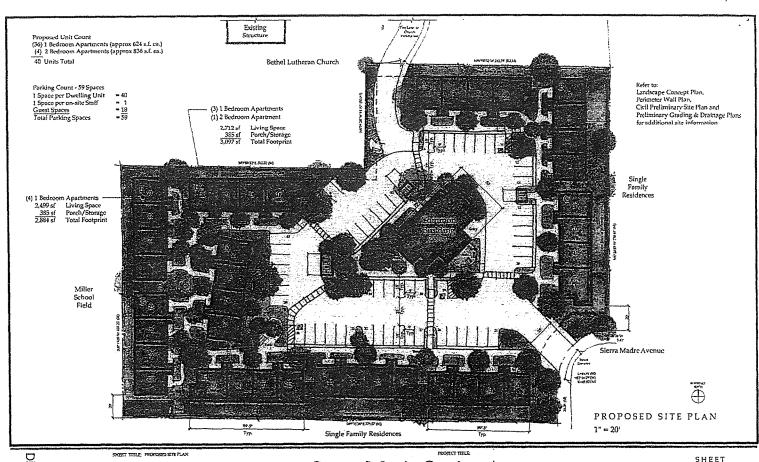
EXHIBIT B SITE PLAN GPZ2014-0005 DECEMBER 31, 2014
